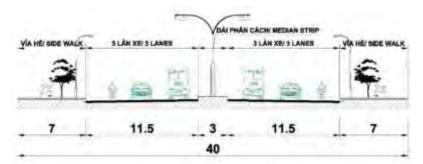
Planned TC13road from Thang Long Bridge to Tu Lien Bridge
